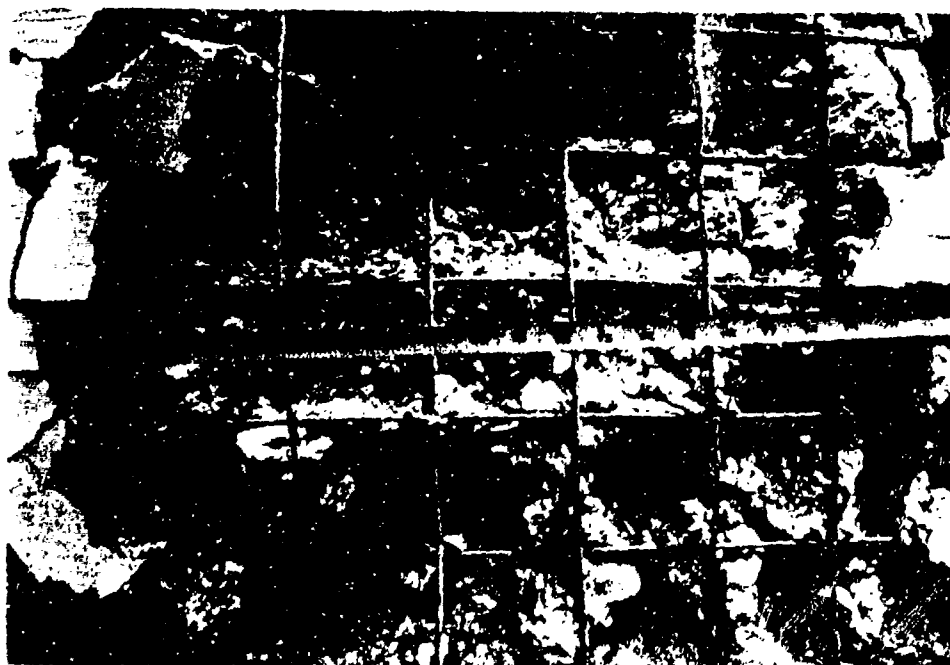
Test 10 Wall Damage Detail (Type A, 2.4-Pound Equivalent Charge).
